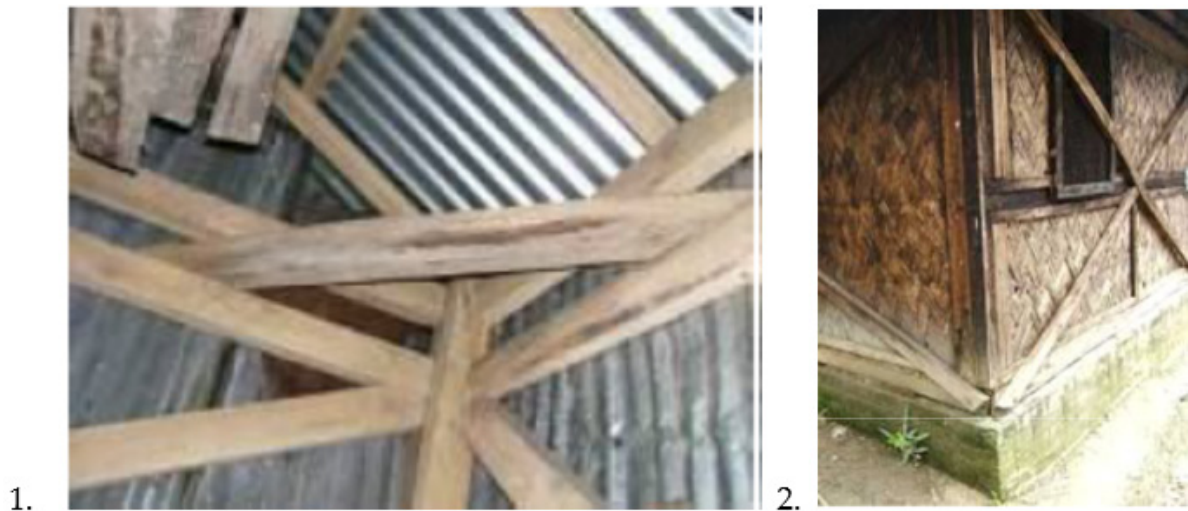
1 & 3 Structural details(Source: Shelter Cluster)
